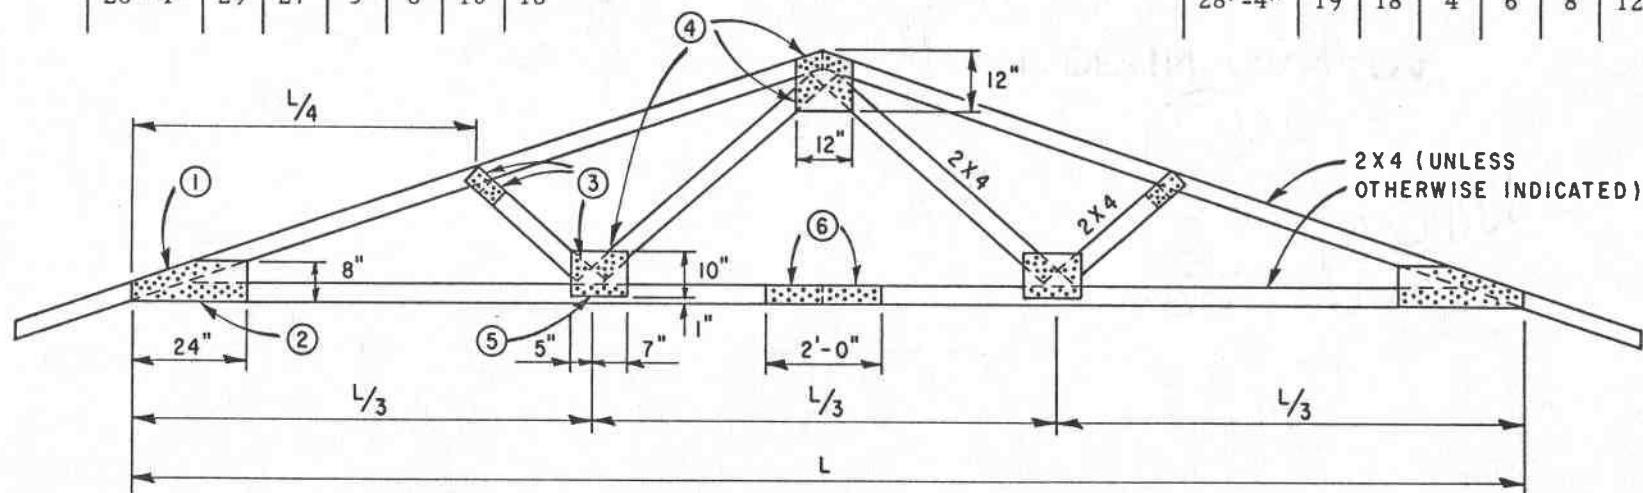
NAILED W TRUSS SPACED 24" O.C.
